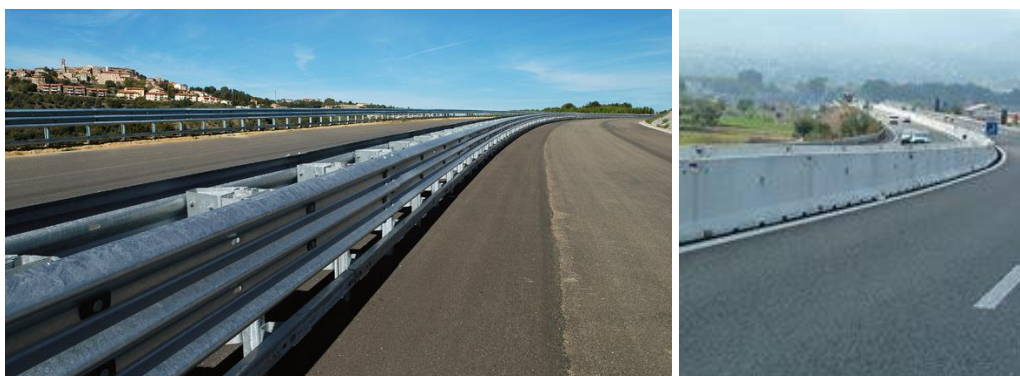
Central safety barriers in steel (left) and in concrete (right).
